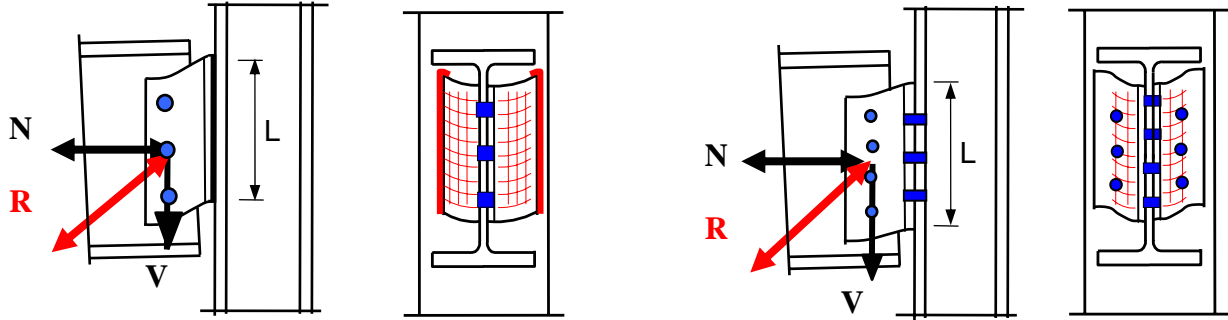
Welded-Bolted and Bolted-Bolted Tee Connection
